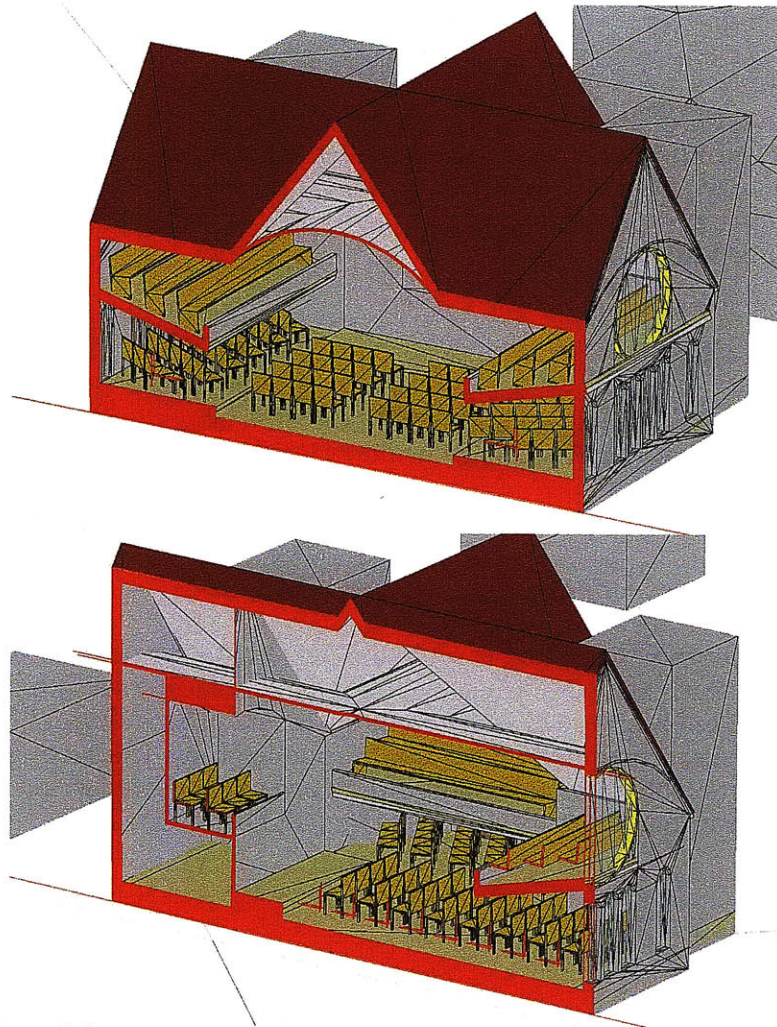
Screenshot of the Ecotect model of the Logan Christian Church before renovations; east-west section looking north; north-south section looking east.
